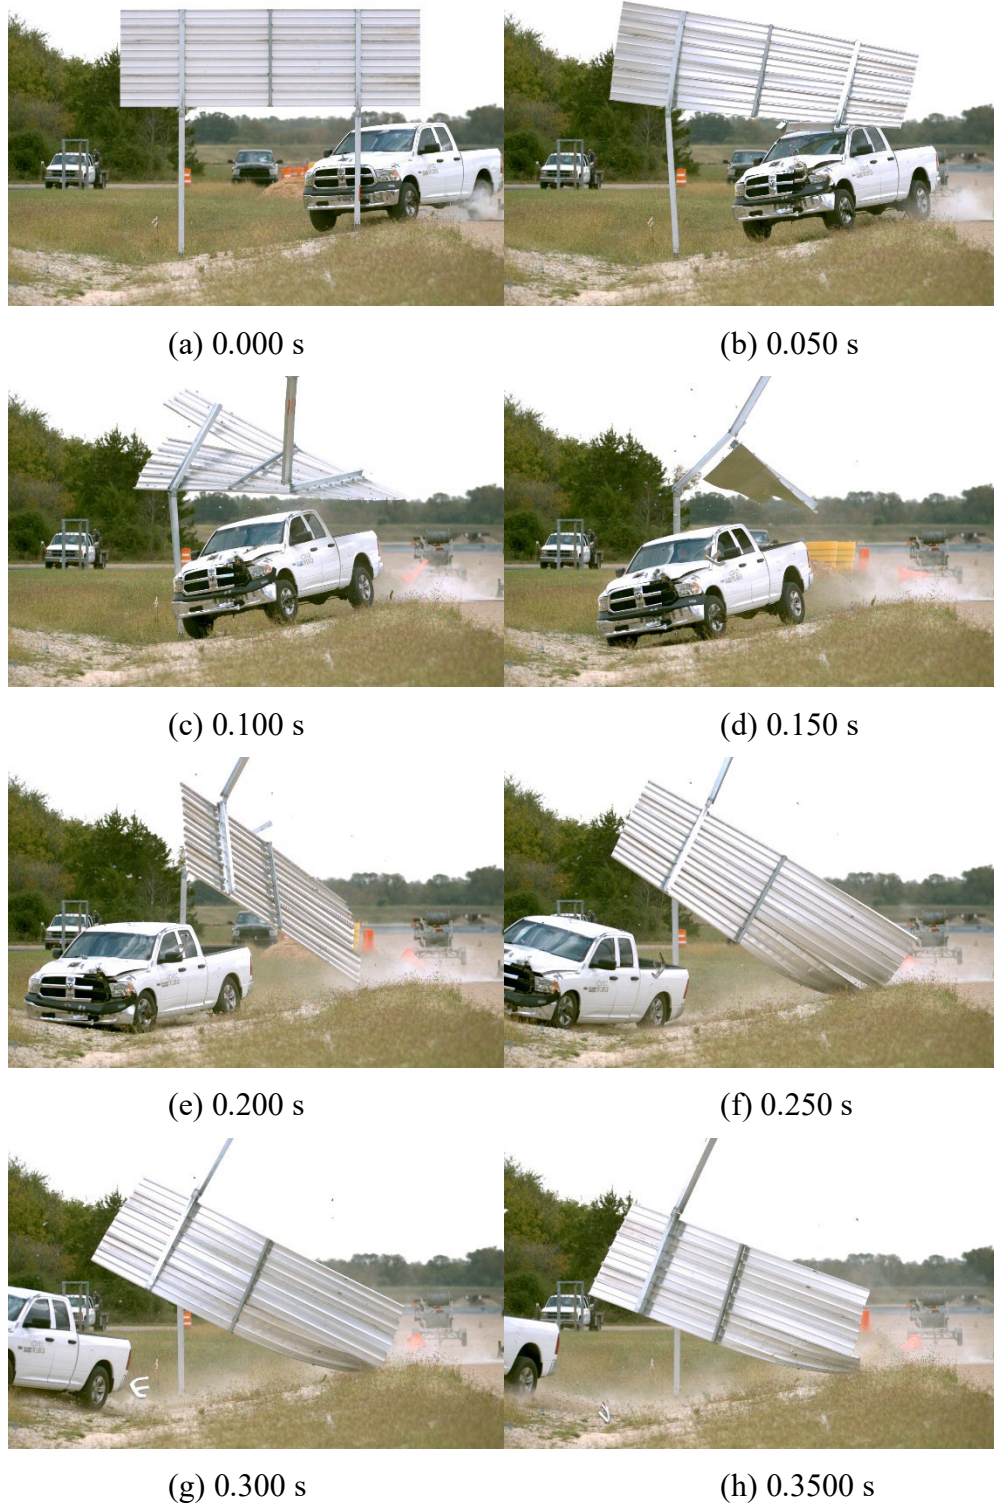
Sequential Photographs for Test No. 612261-05-2 (Frontal Views).
